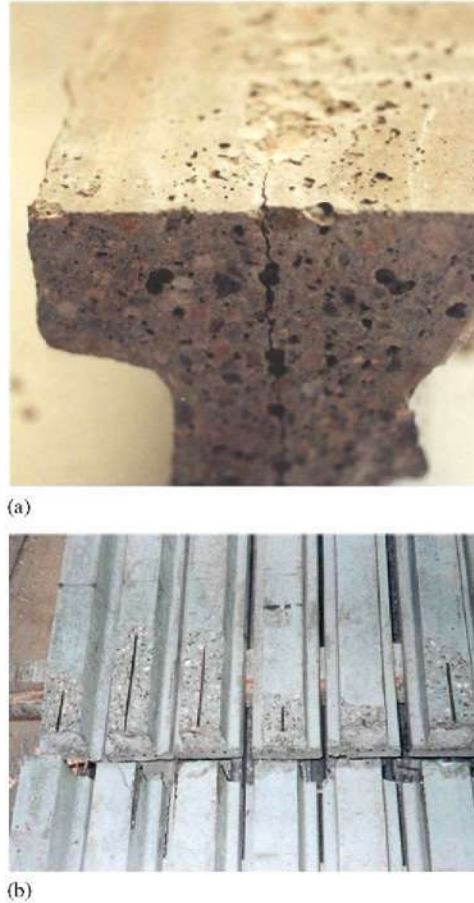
Two examples of splitting failure in precast prestressed joists.
